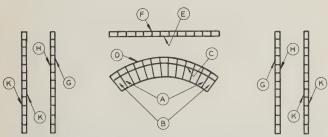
Schematic floor plan of switchboard showing location of equipment
